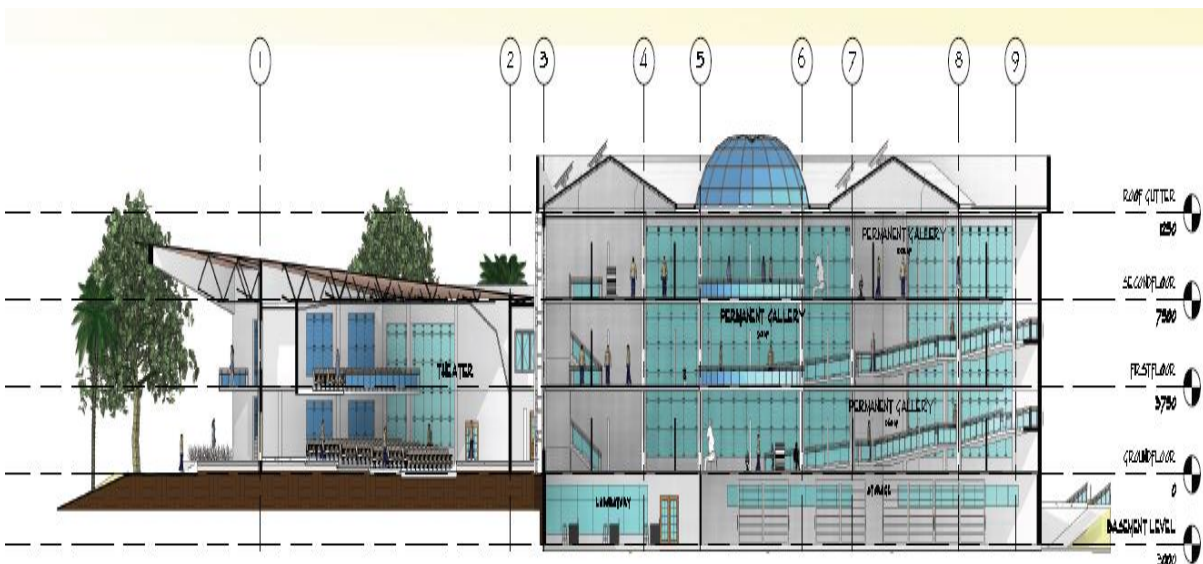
Section BB showing the photovoltaic installation and the overhang cantilever
